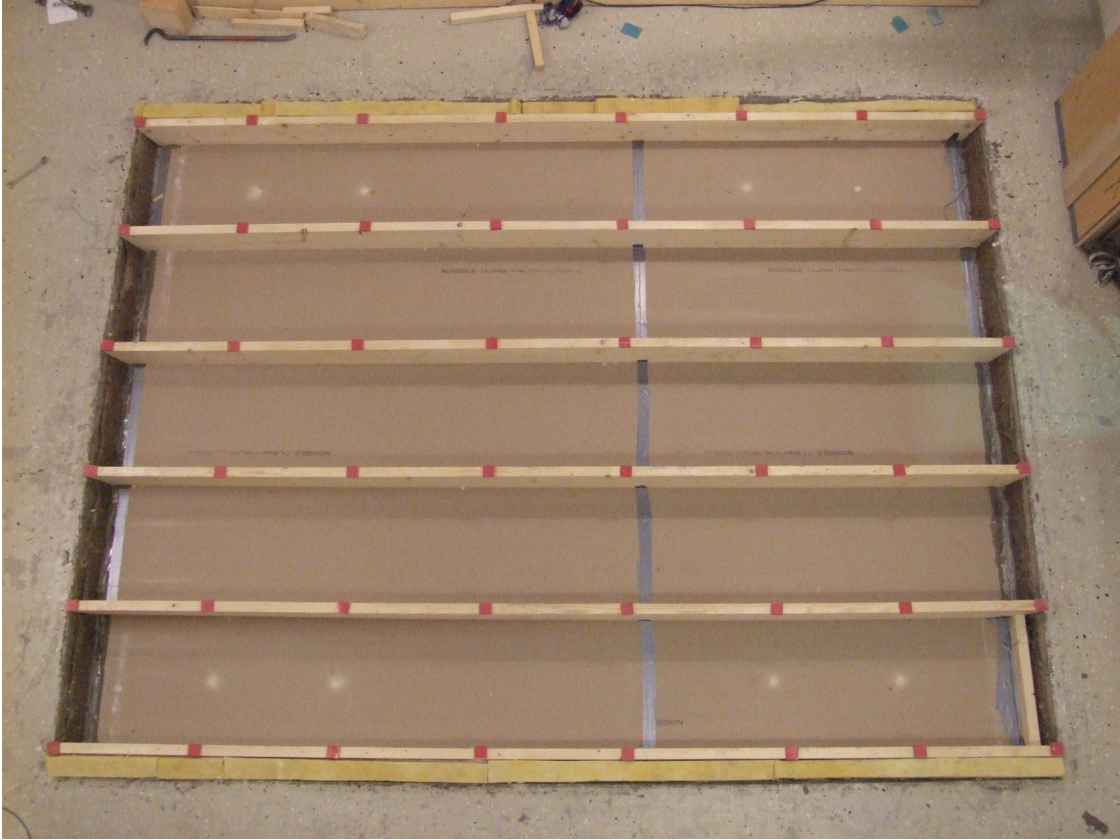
Upper floor 22 mm tongued and grooved board finished.
